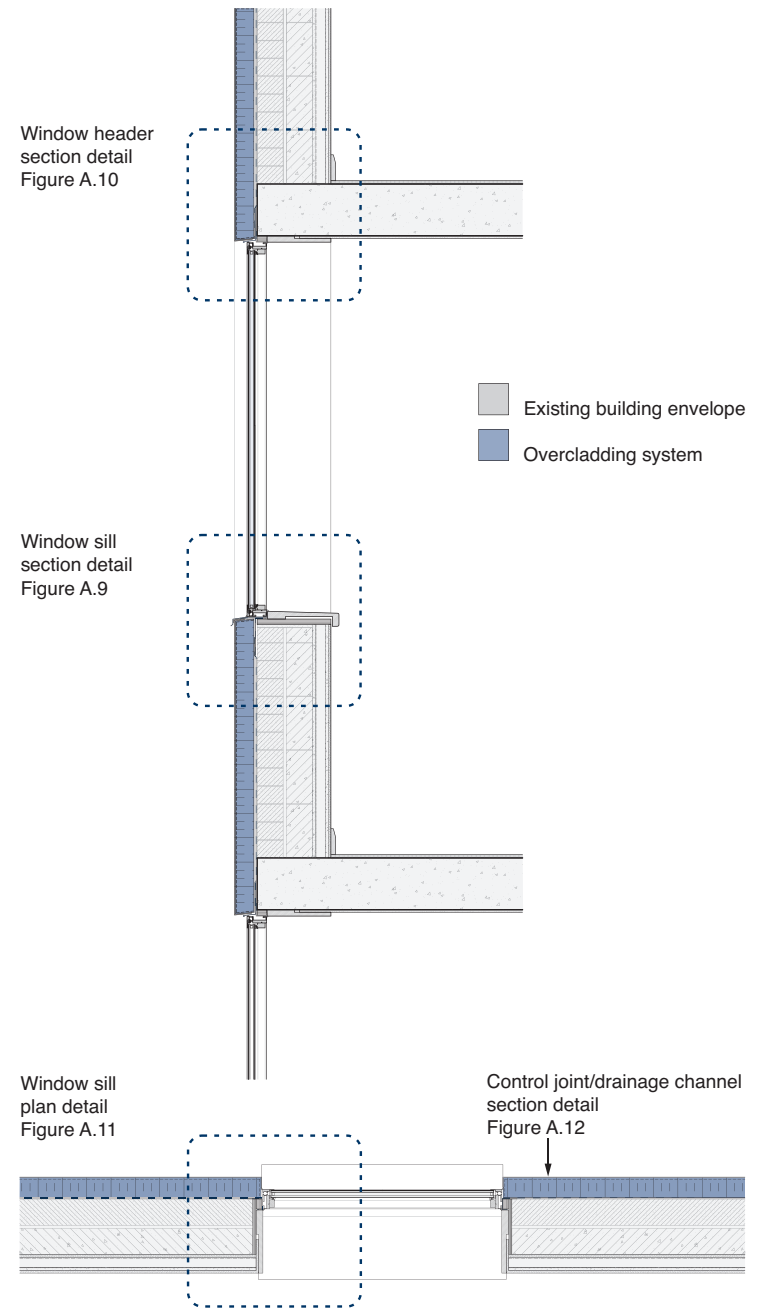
Section and plan views of a typical wall and window assembly with corresponding detail drawings denoted.
